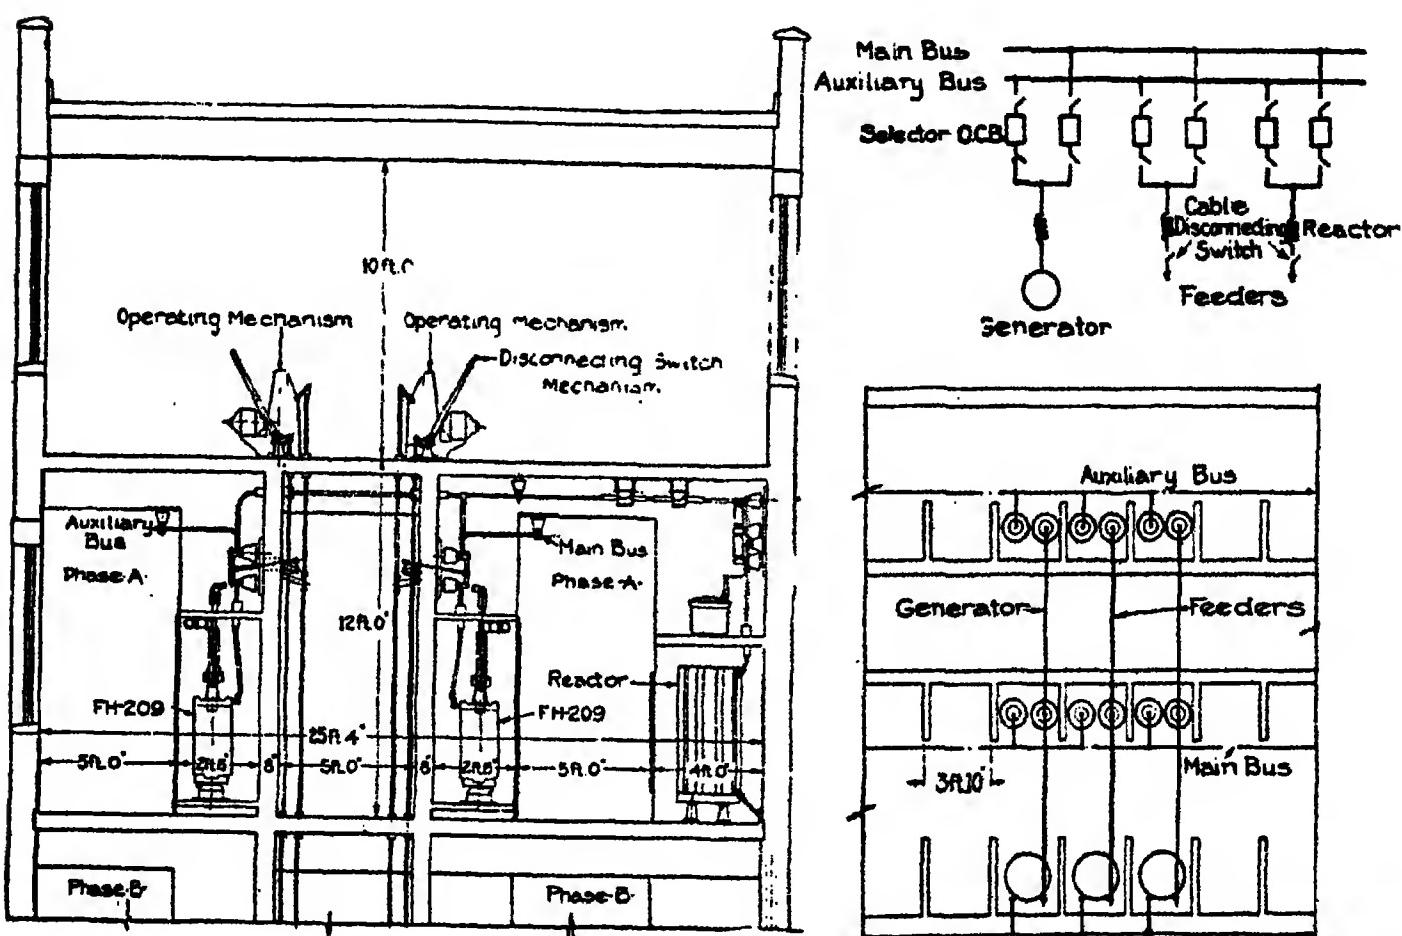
Single-line diagram of connections and corresponding switch-house arrangements.
